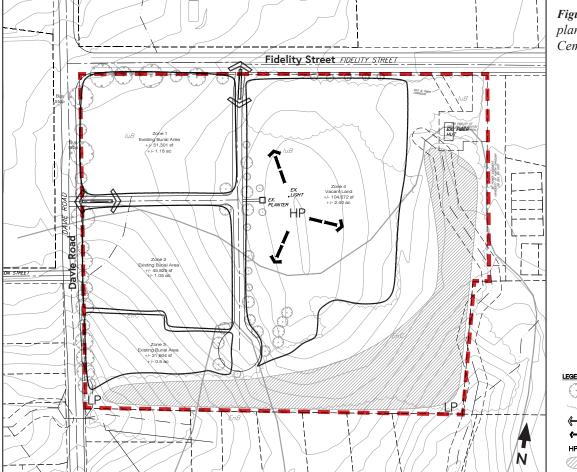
Topographic plan of Westwood Cemetery. (CVDA)
